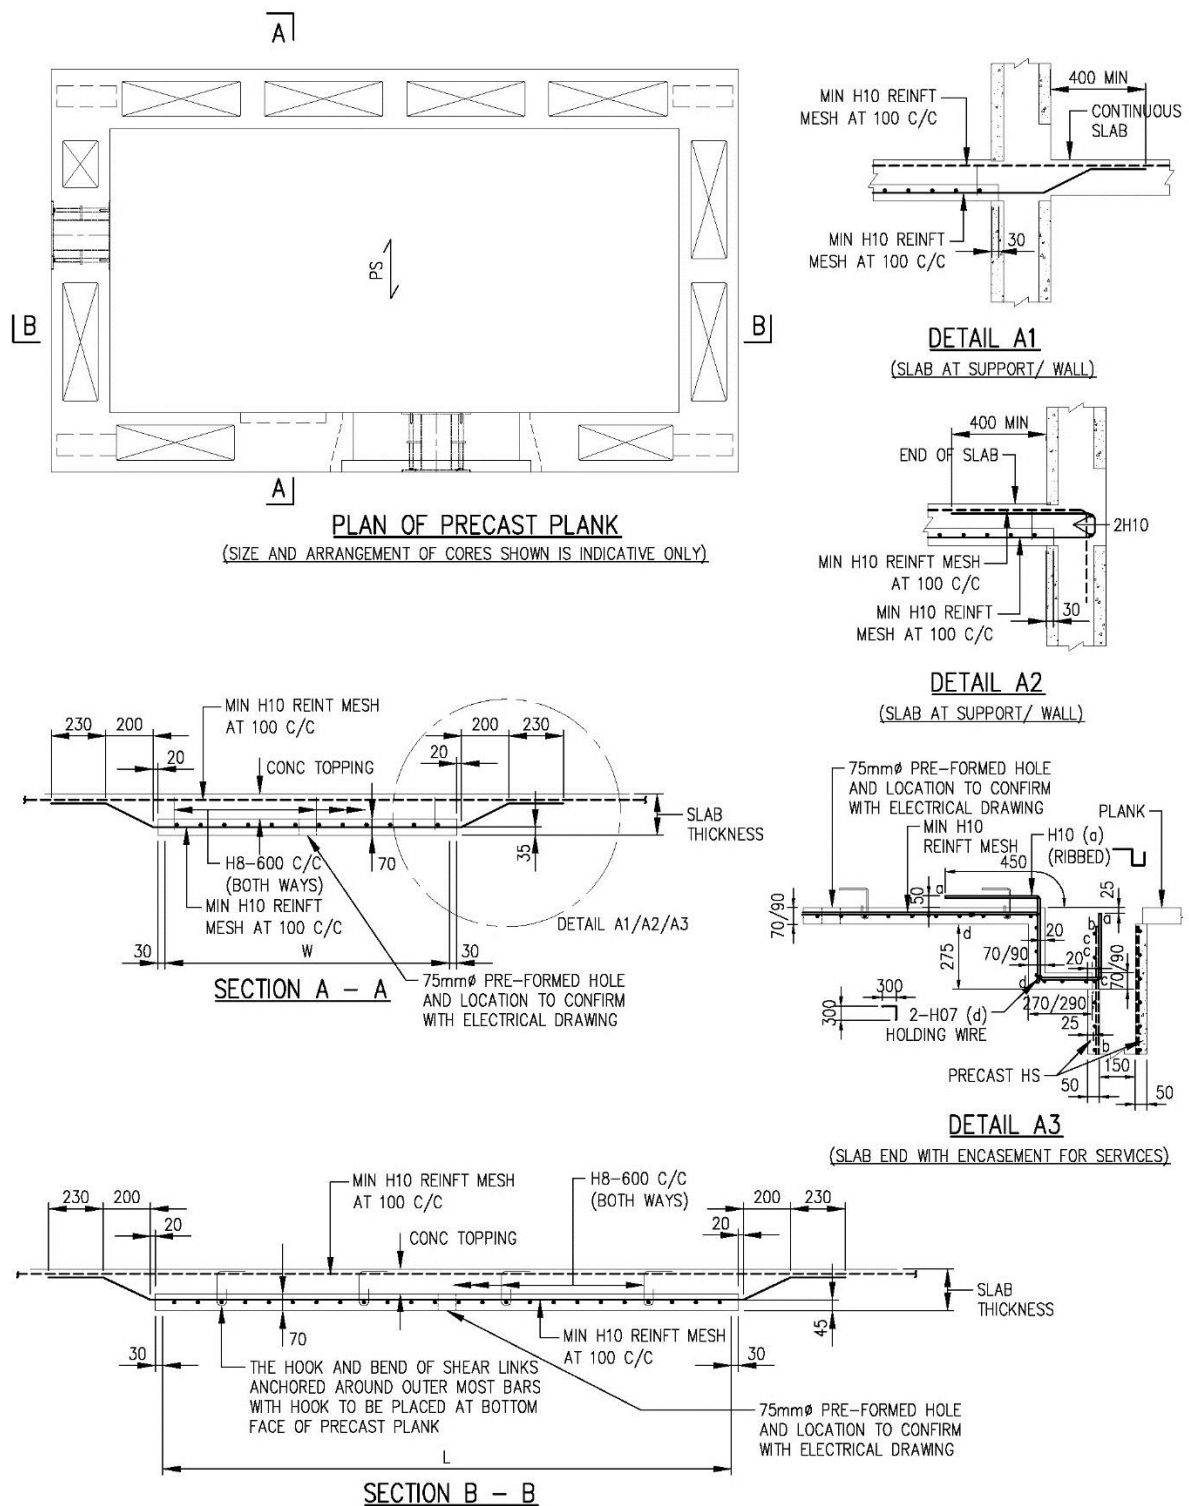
DETAILS OF PRECAST PLANK (MARKED AS PS) AND CONCRETE TOPPING
